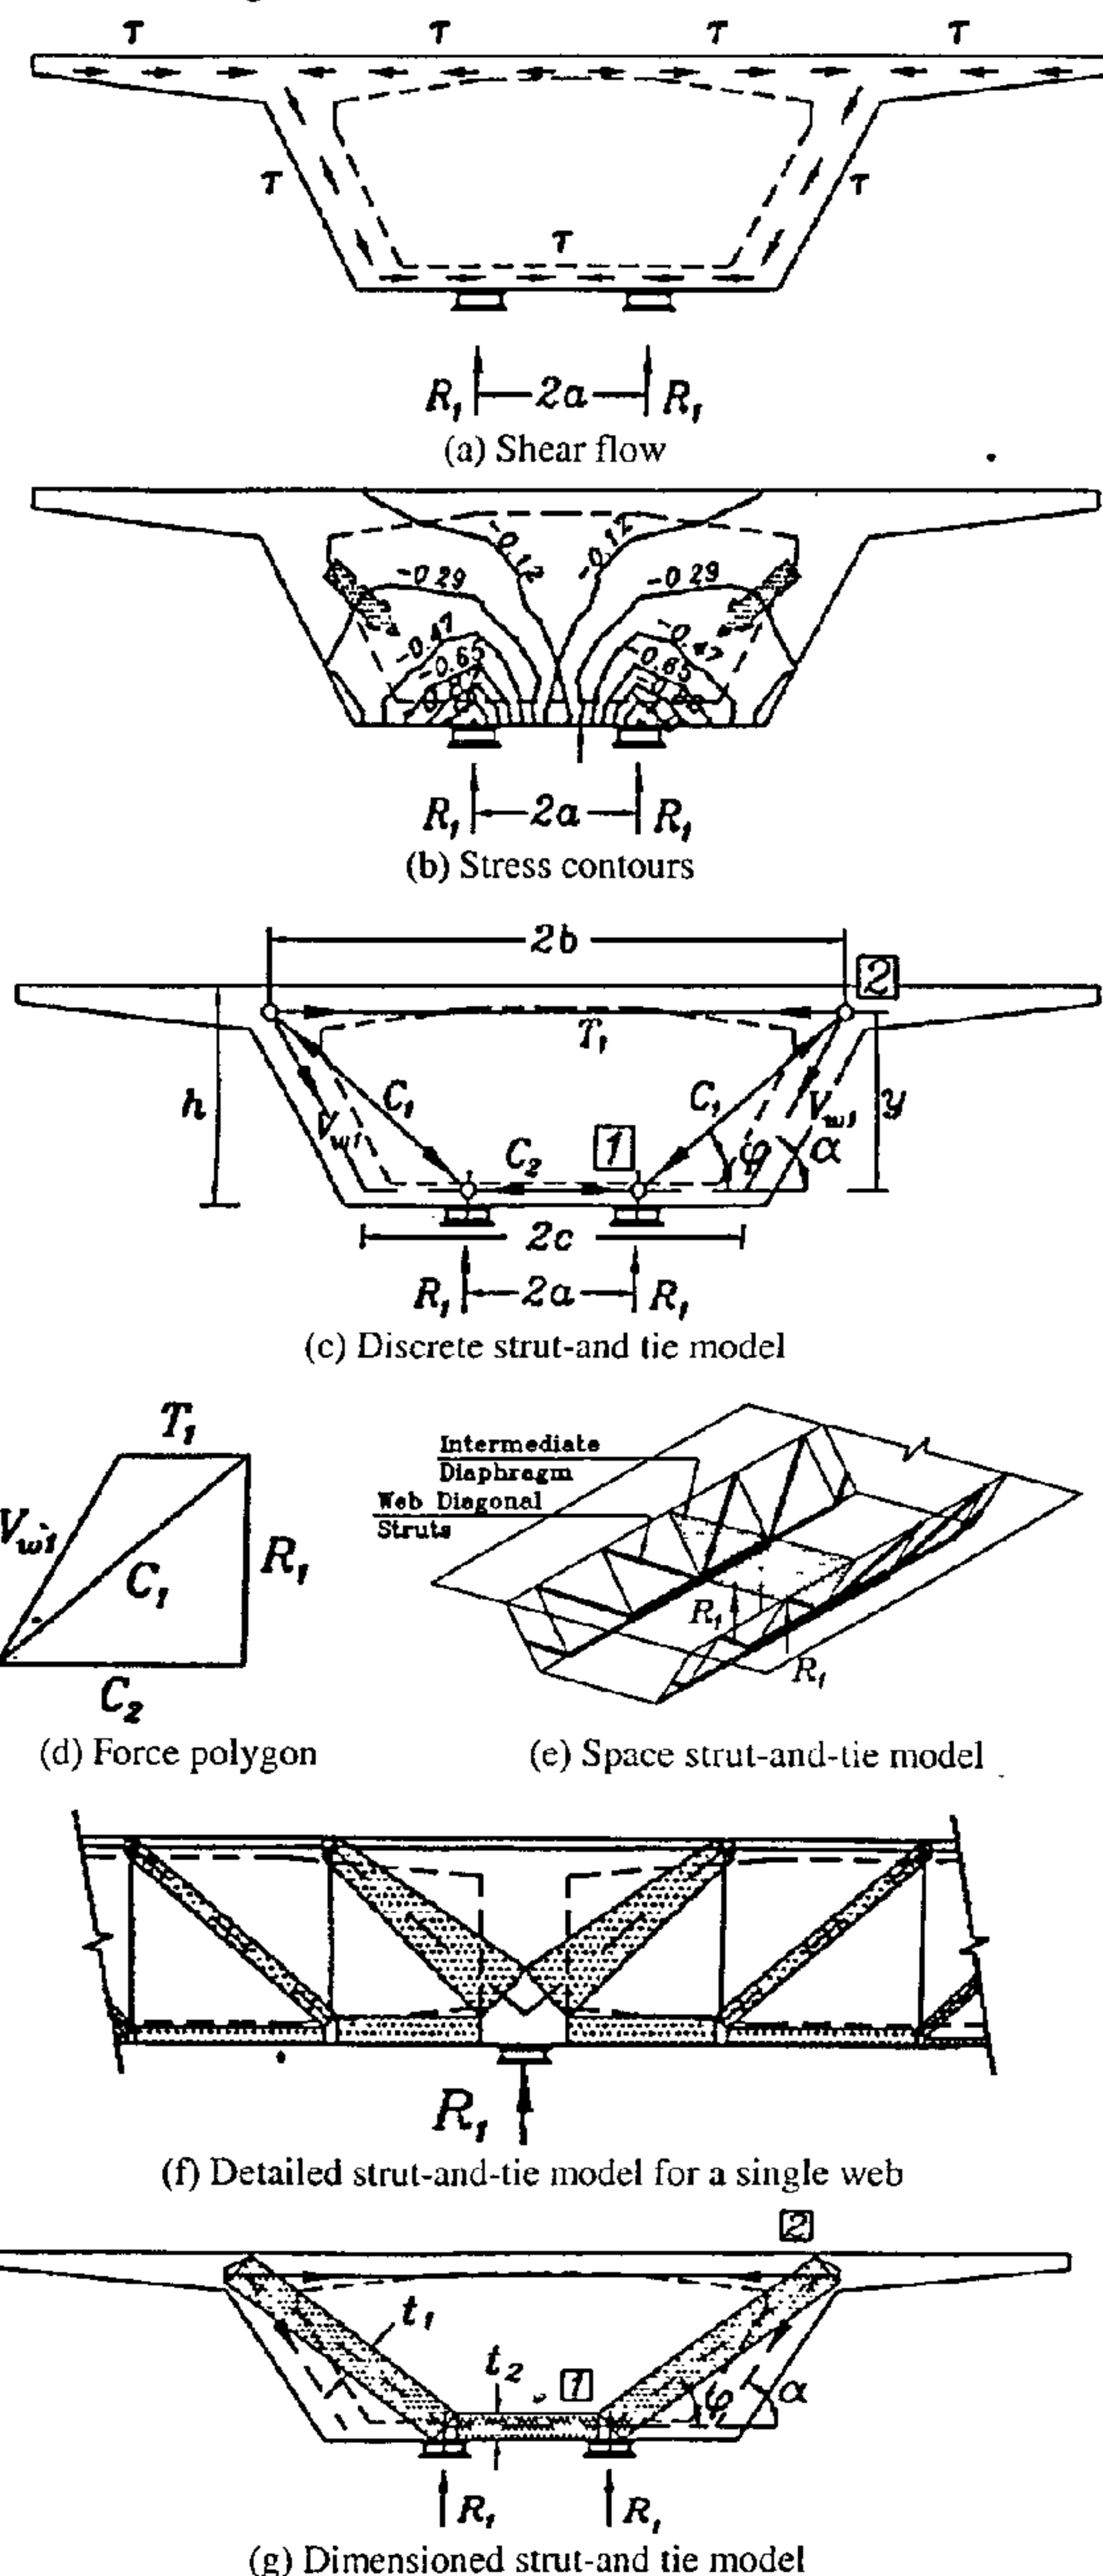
Strut and tie model for a box-girder diaphragm under maximum concentric loading
